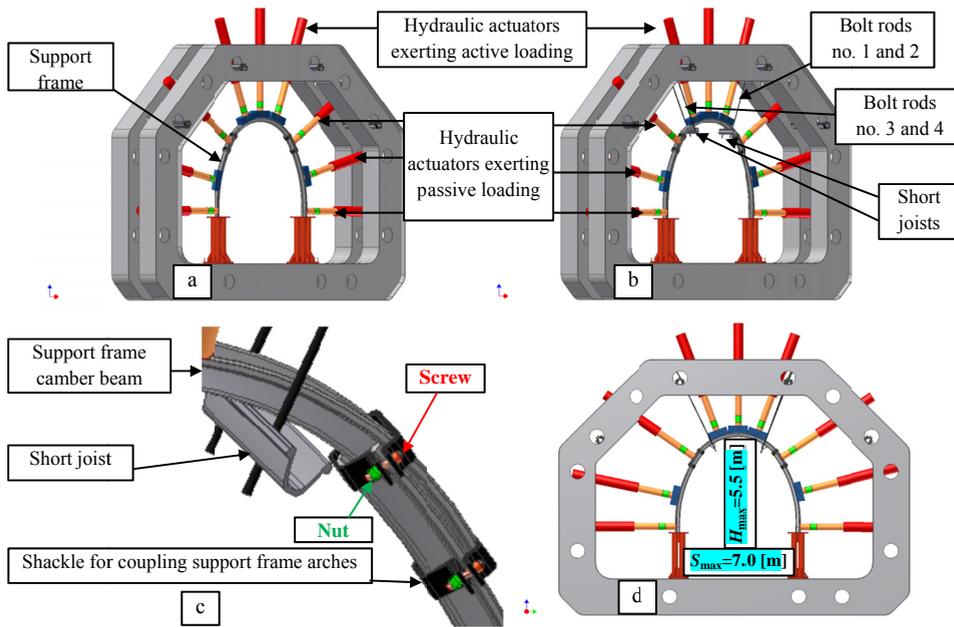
Facility diagram for testing support systems: a – steel arch; b – mixed; c – short joist with two bolts in the area of the support frame joint; d – maximum support frame dimensions
